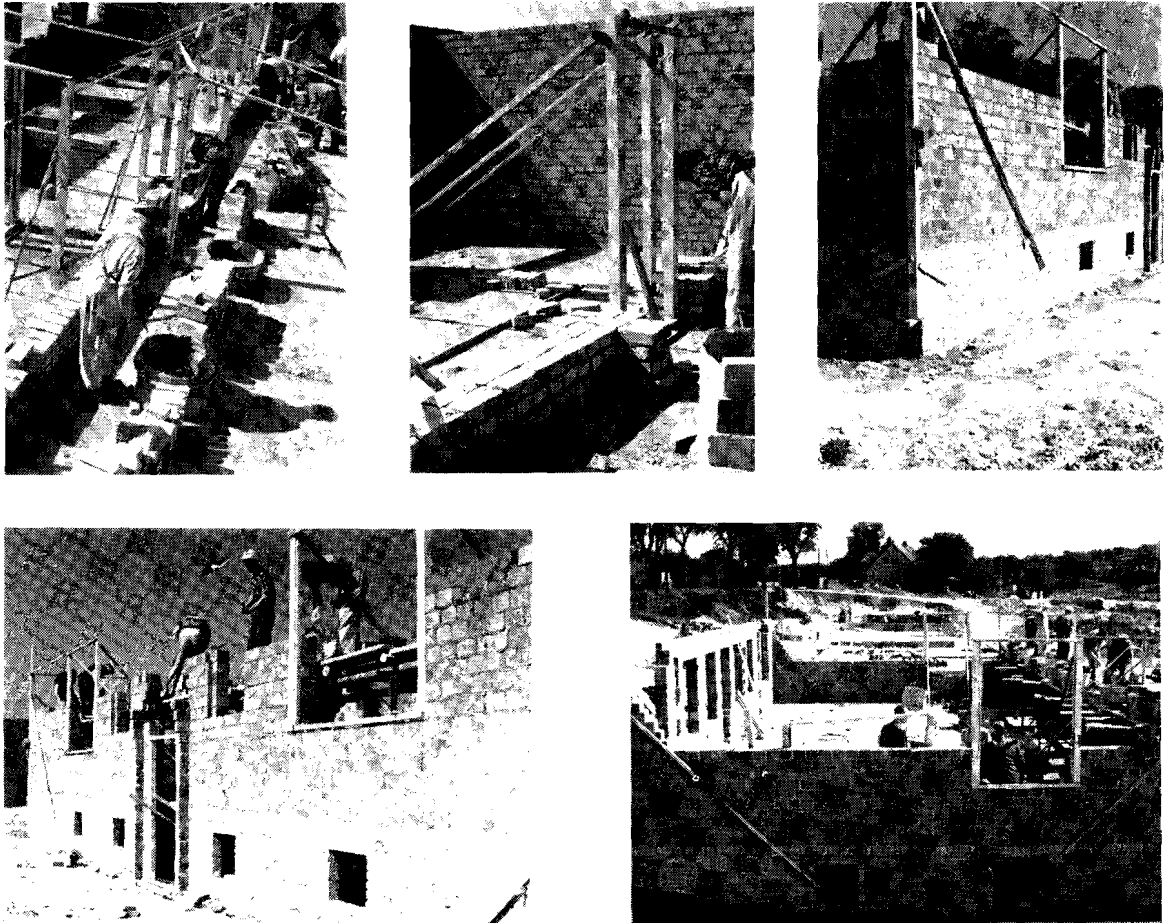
Wooden window and door frames of the Dutch type being used in Germany.
